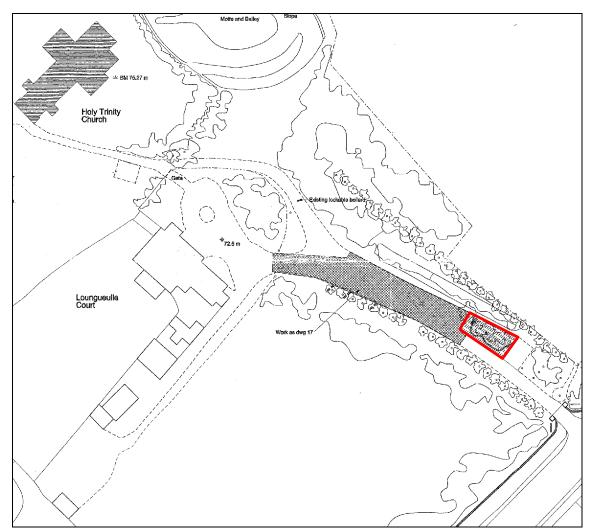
Site plan, with car parking area outlined in red (not to scale)
